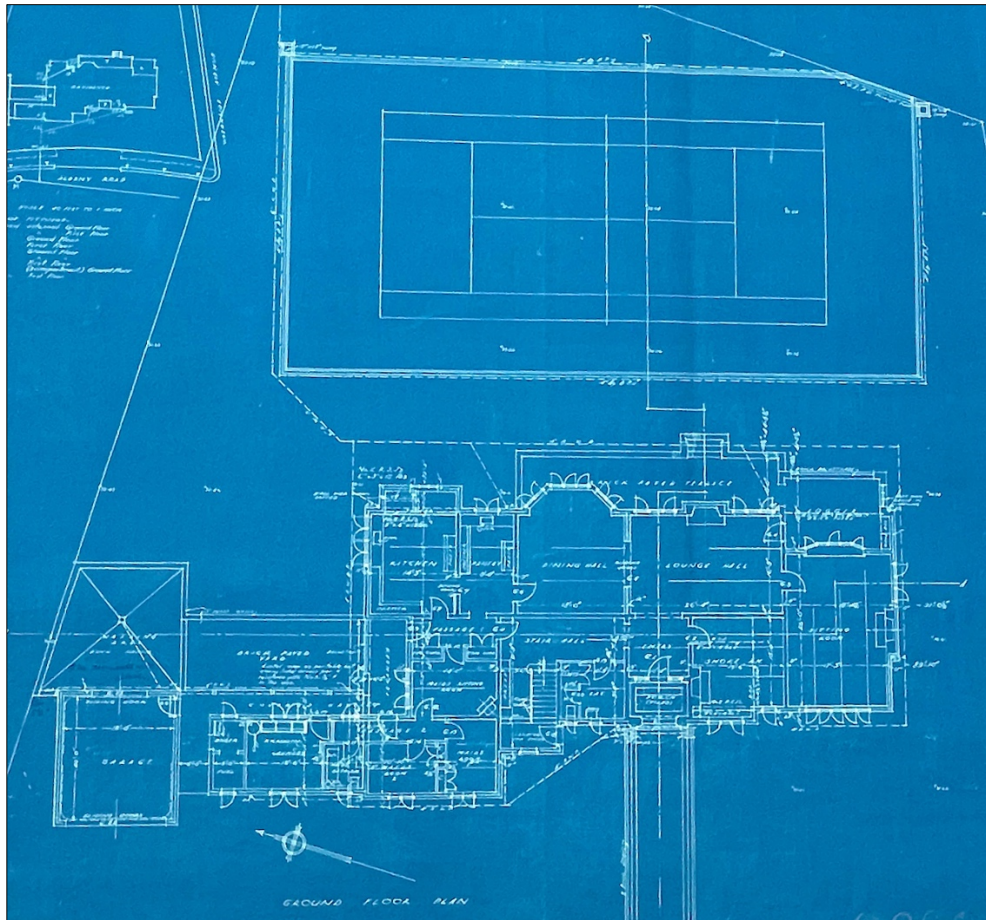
c.1926 Ground floor plan of Little Milton with tennis court at the rear. Source: Stonington History Centre.
